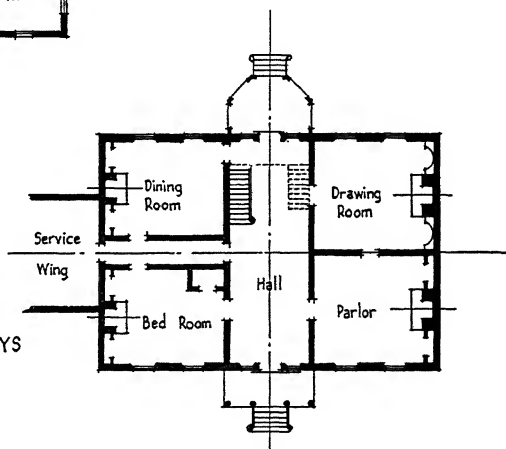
CHARACTERISTIC HOUSE PLANS OF AMERICAN COLONIES BASED ON CHIMNEY ARRANGEMENTS
